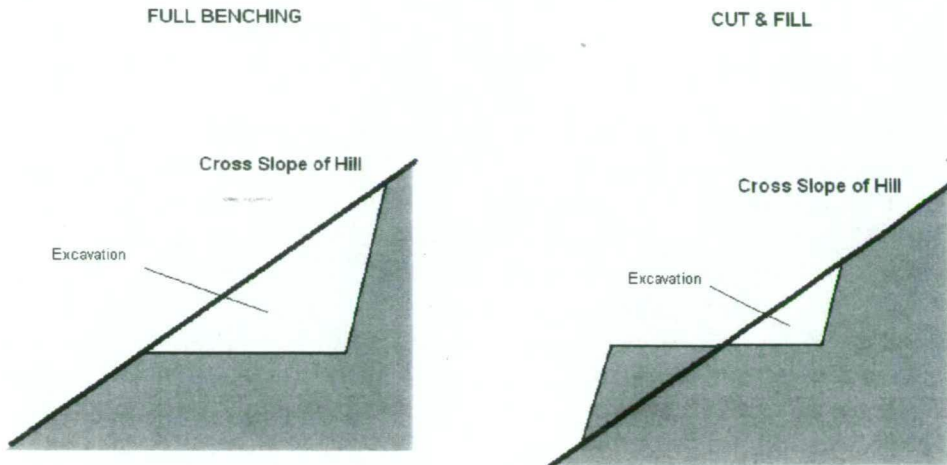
Sketch of Full Benching and Cut & Fill Benching
